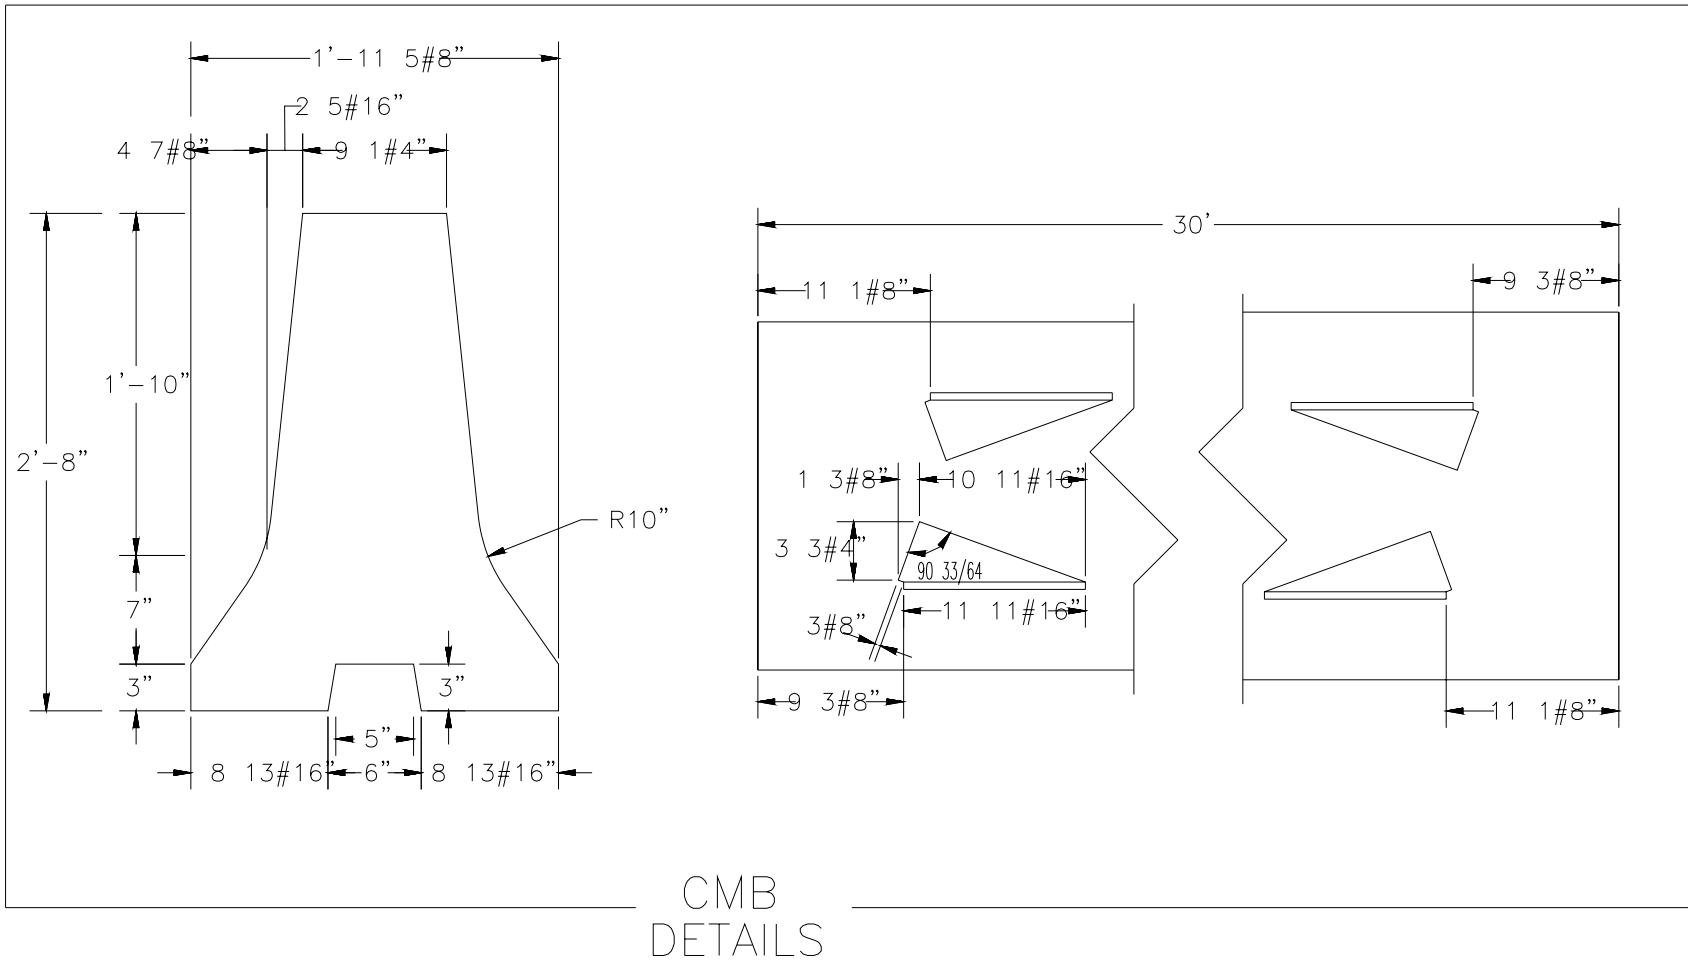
Details of the Cross-Bolt, F-Shape Precast Concrete Traffic Barrier.
